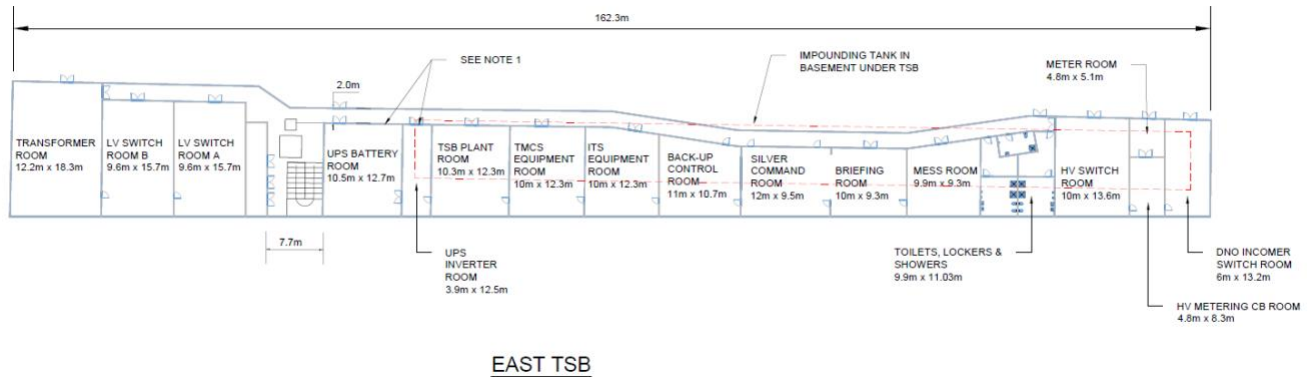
Tunnel Service Building plan view (extract from QS6A drawings)
